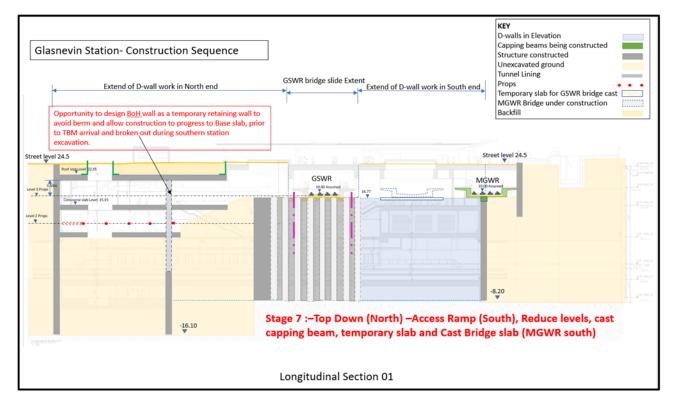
BoH Wall Designed as Temporary Retaining Wall
